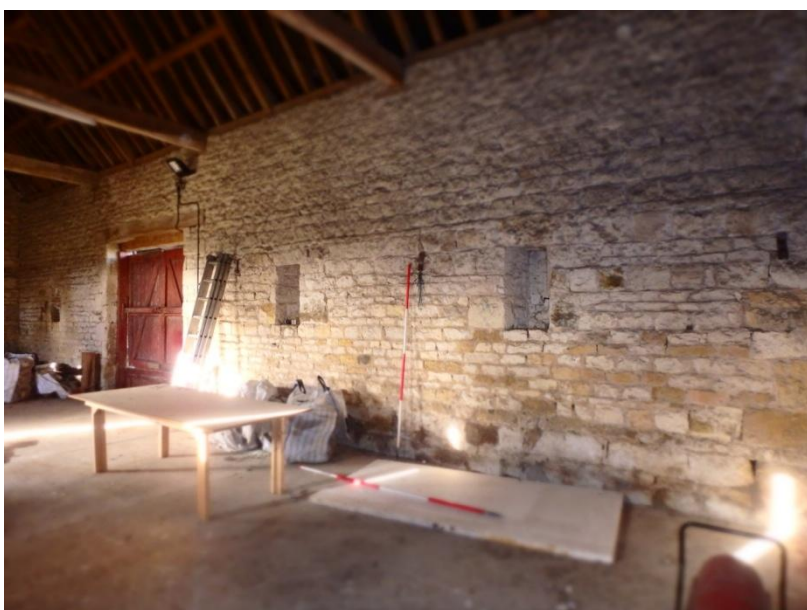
View of the roof supporting structure of Cell 3, from the west
